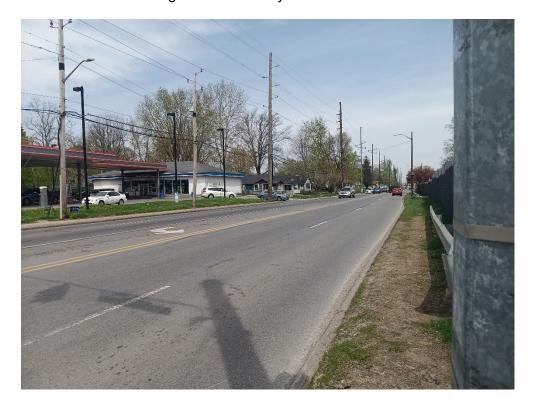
Looking north up Keystone Avenue form 35th Street.
